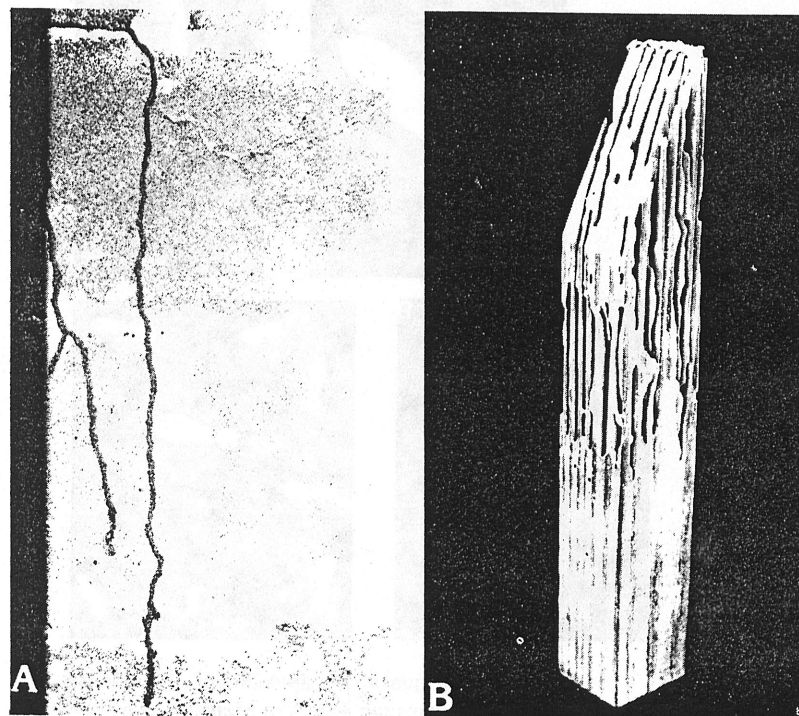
Subterranean termite: A, shelter tube on foundation wall; B, damage to a pine stake.
